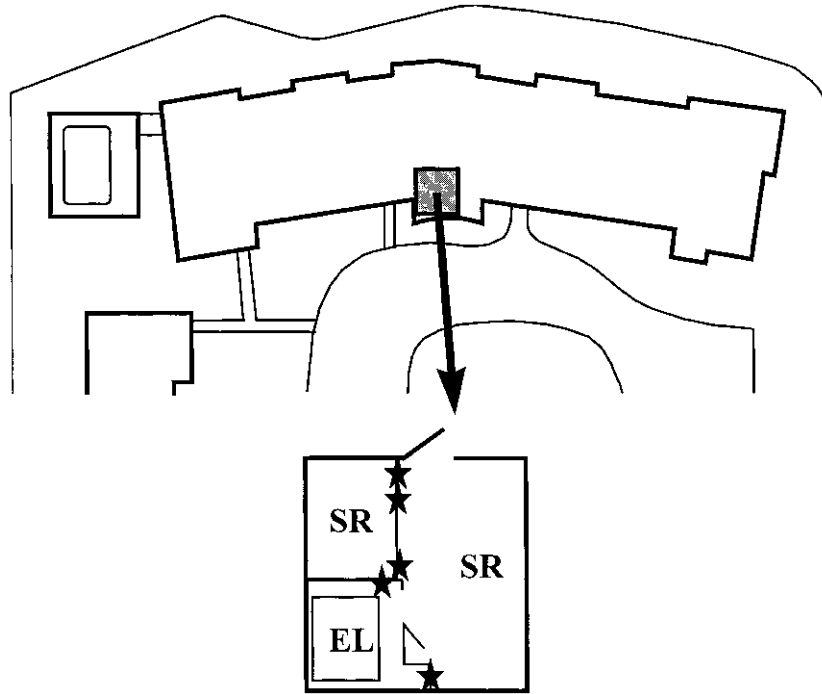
Floor plan of roof top of six-story Condo2. Shaded area is elevator machinery (EL)/storage room (SR) infested with Formosan subterranean termites prior to application of aboveground bait stations. Stars show placement sites of bait stations on 2 x 4 wood framing in machinery/storage room.
